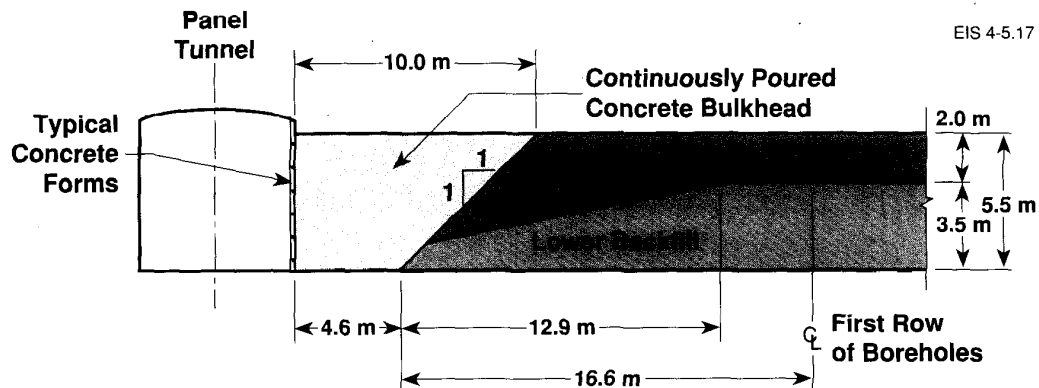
Installation of Concrete Bulkhead at Room Entrance (after AECL CANDU et al. 1992)
